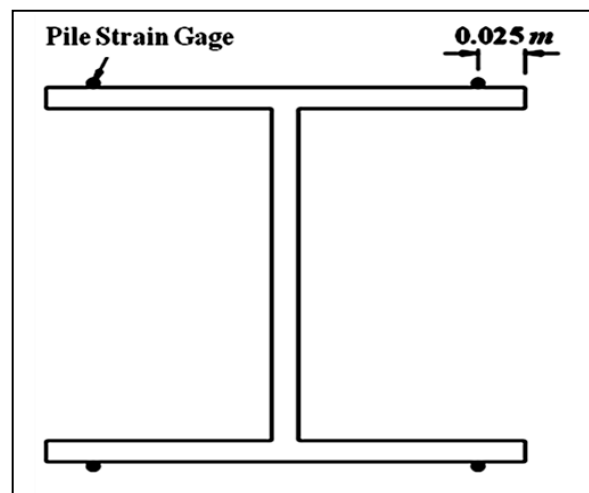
Pile strain gauge layout of an instrumented pile.
